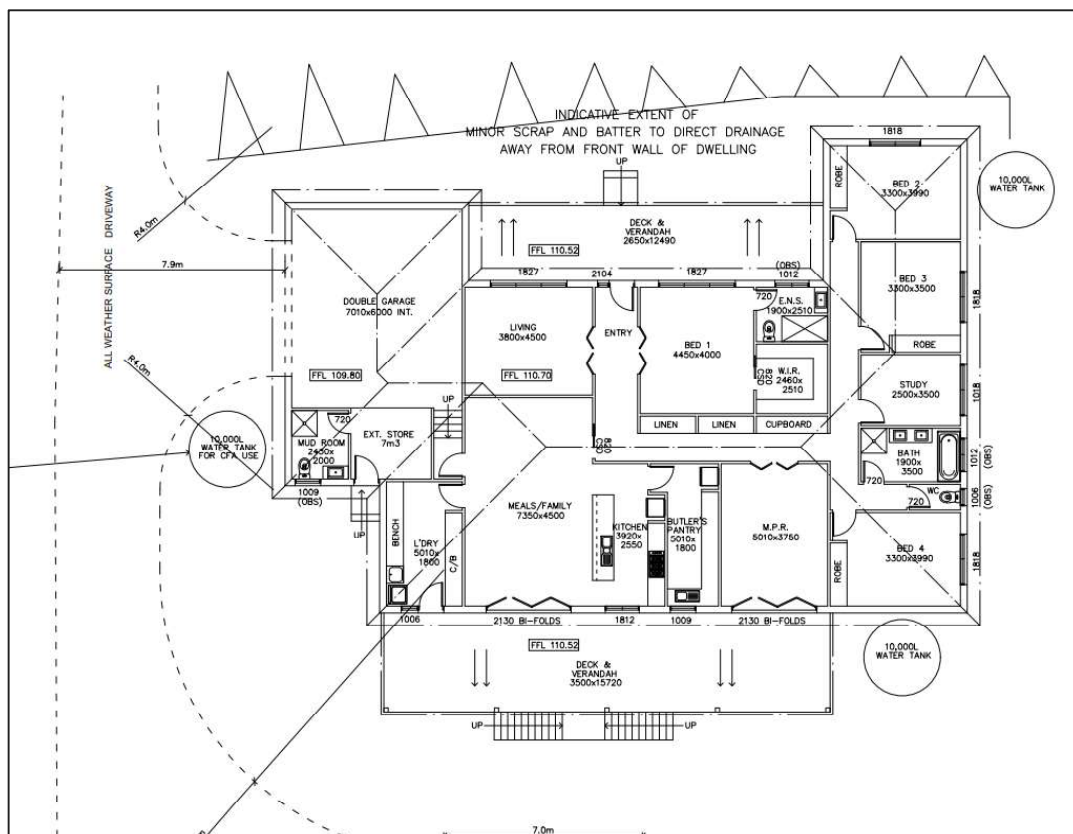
Proposed site plan and dwelling surround (Source: Applicant submission Philip Harvey and associates)
